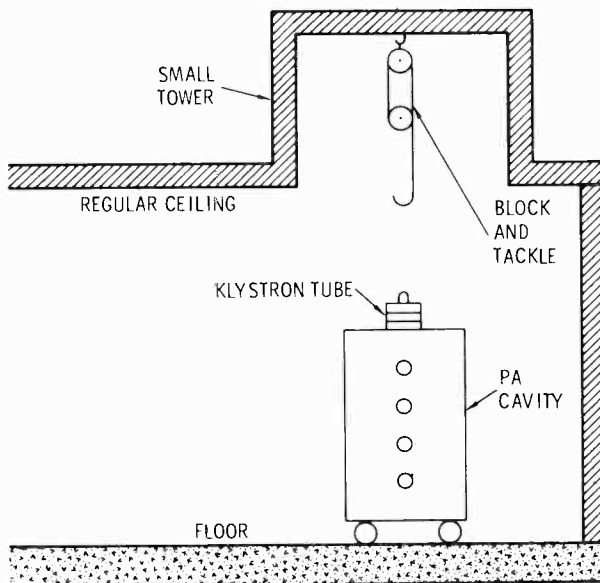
If the transmitter room ceiling is too low, a small tower should be built to facilitate replacement of klystron tubes.
